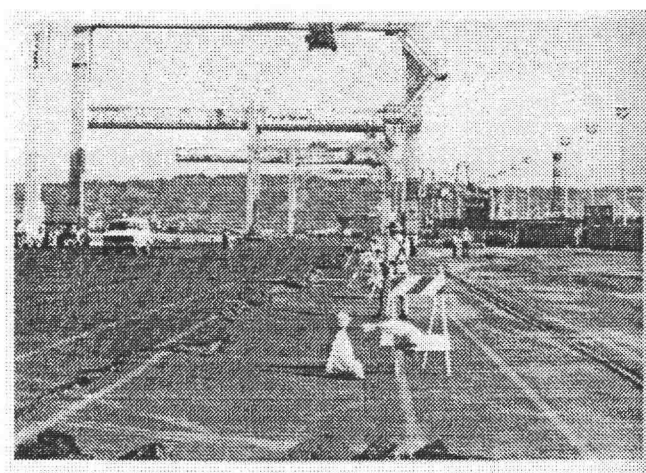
Settlement of fill supporting inboard bridge crane rail (photograph by Marshall Lew)
